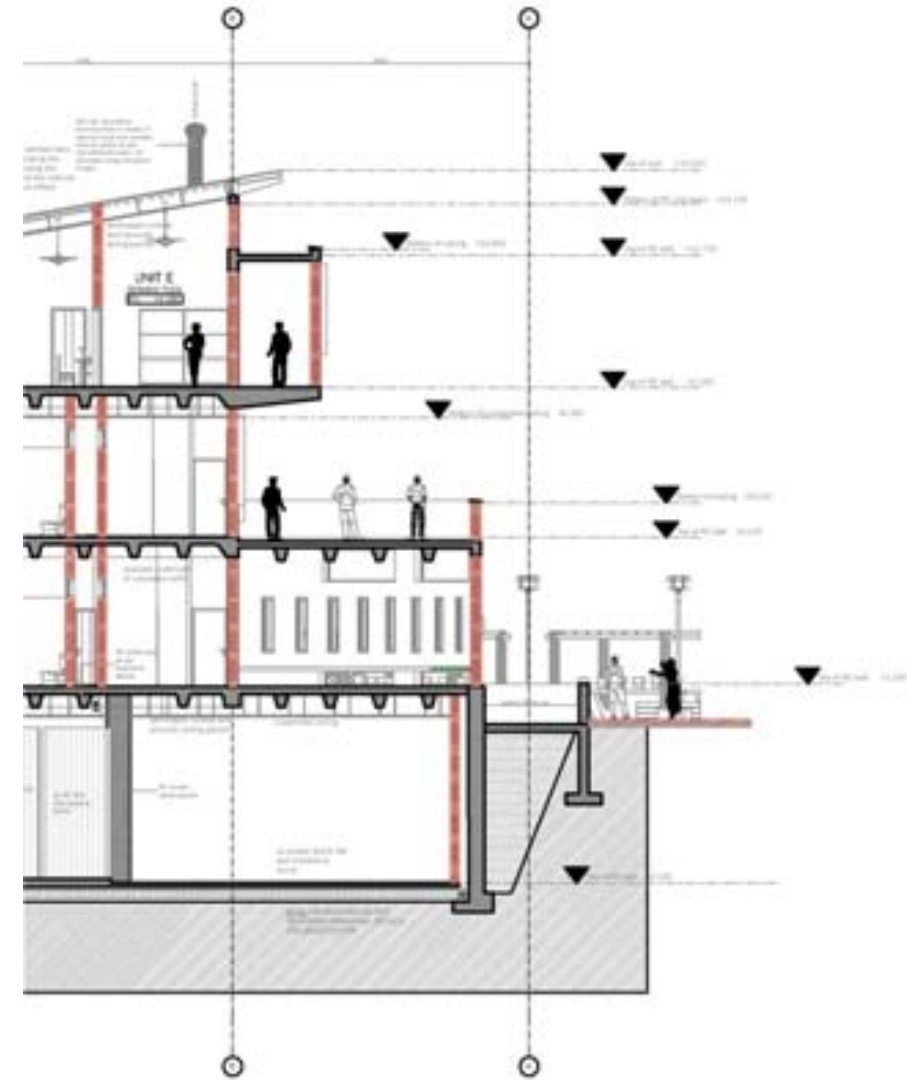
Section B-B. Scale 1:200. (Author, 2009).
